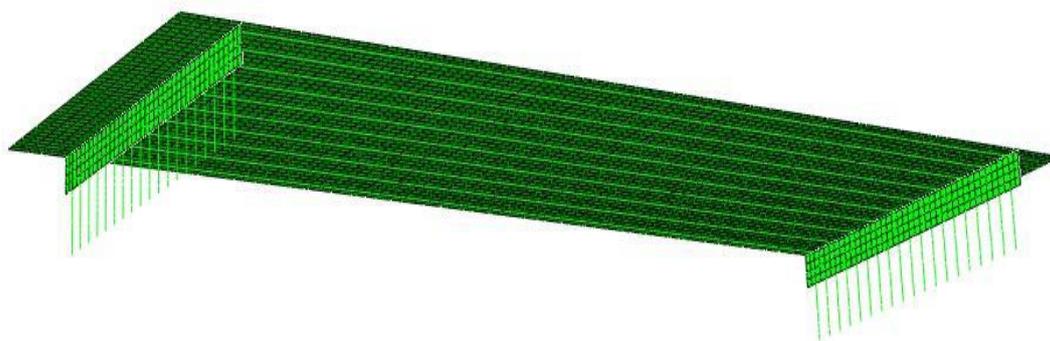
Undeformed shape of the FEM of the Scotch Road Bridge using Abaqus/Cae.
